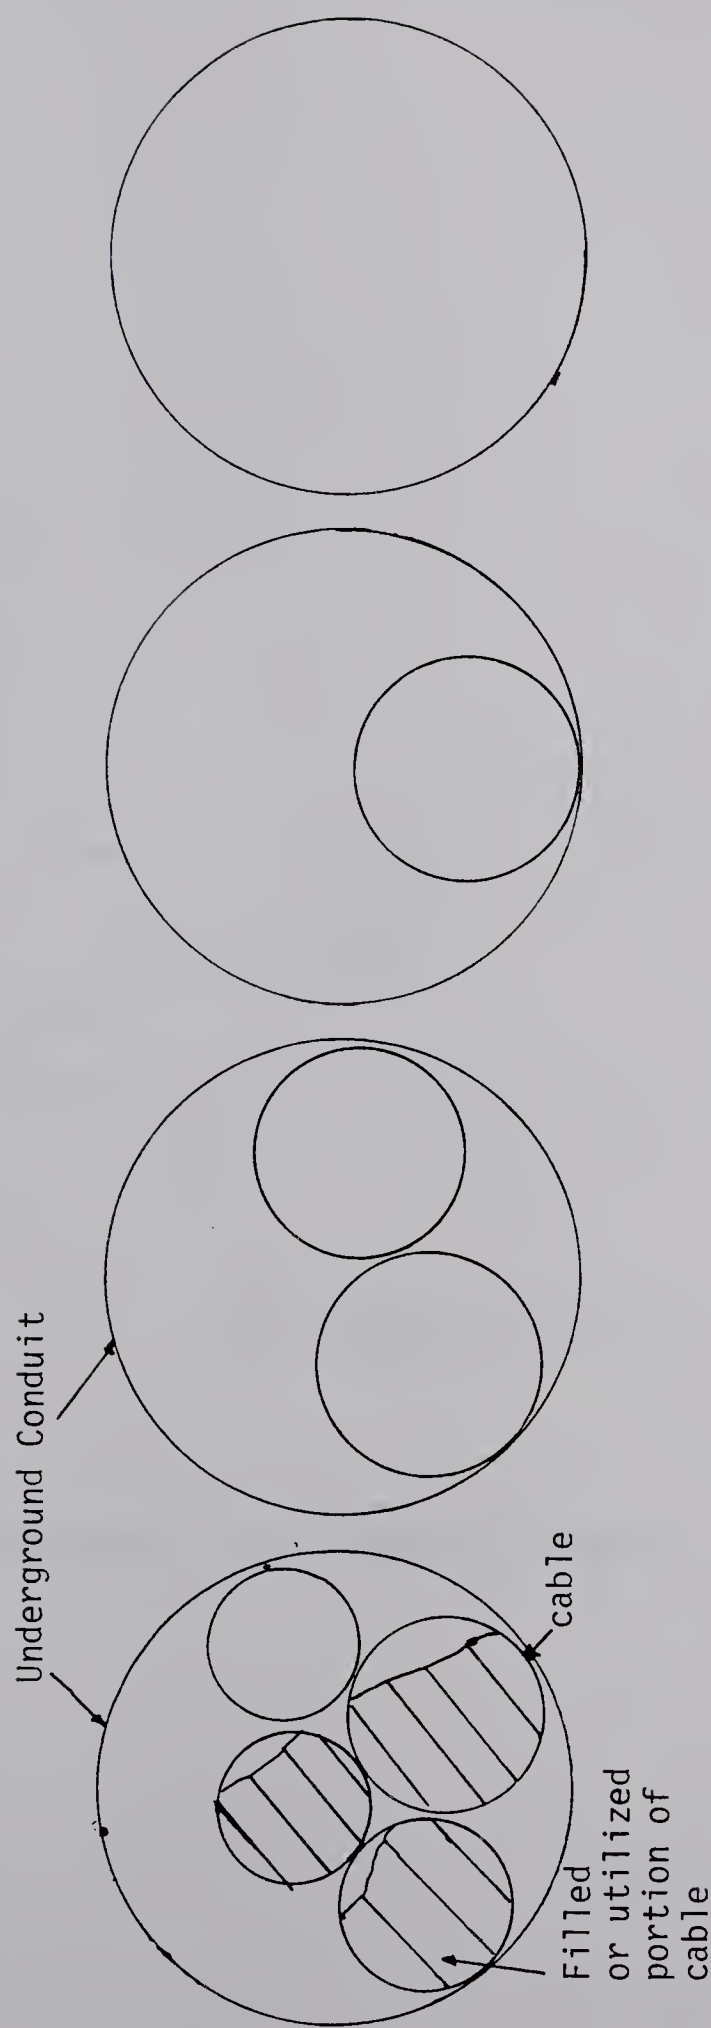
Cable Fill in a Four-Way Underground Conduit
